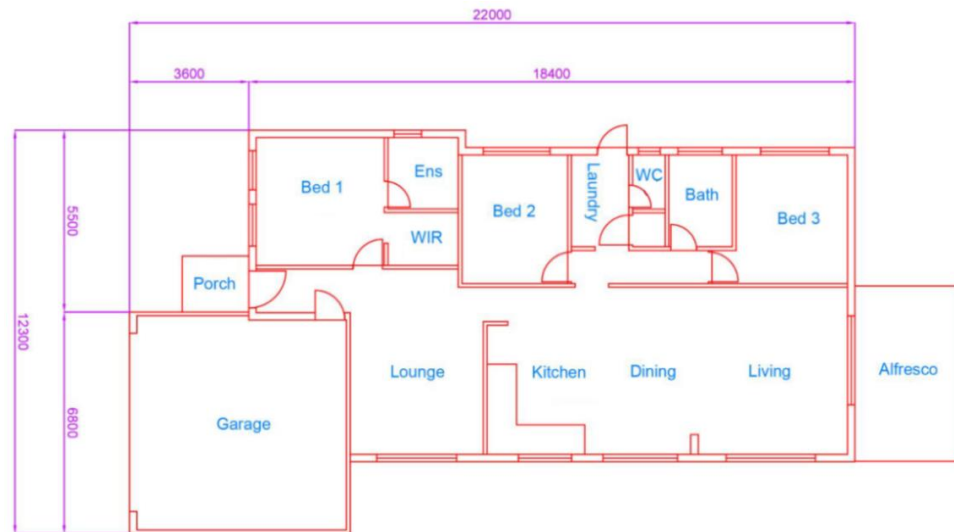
Floor plan of the house of concern (Wong 2013).
